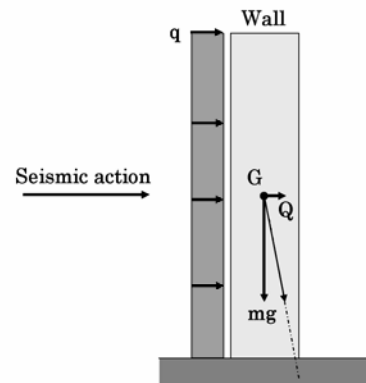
Transfer to the ground of actions horizontally loading a wall.
